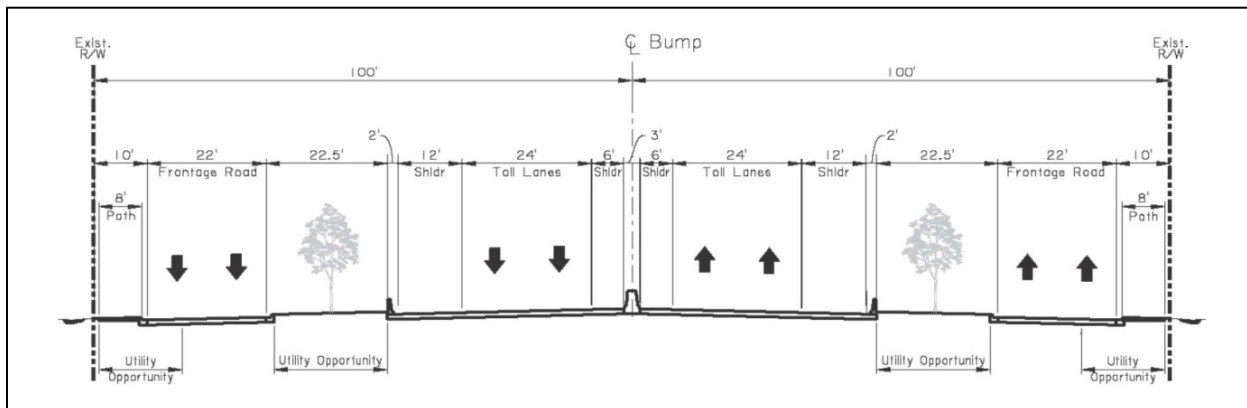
BUMP Typical Section – 200’ ROW Section (exhibit from BUMP Proposal)
